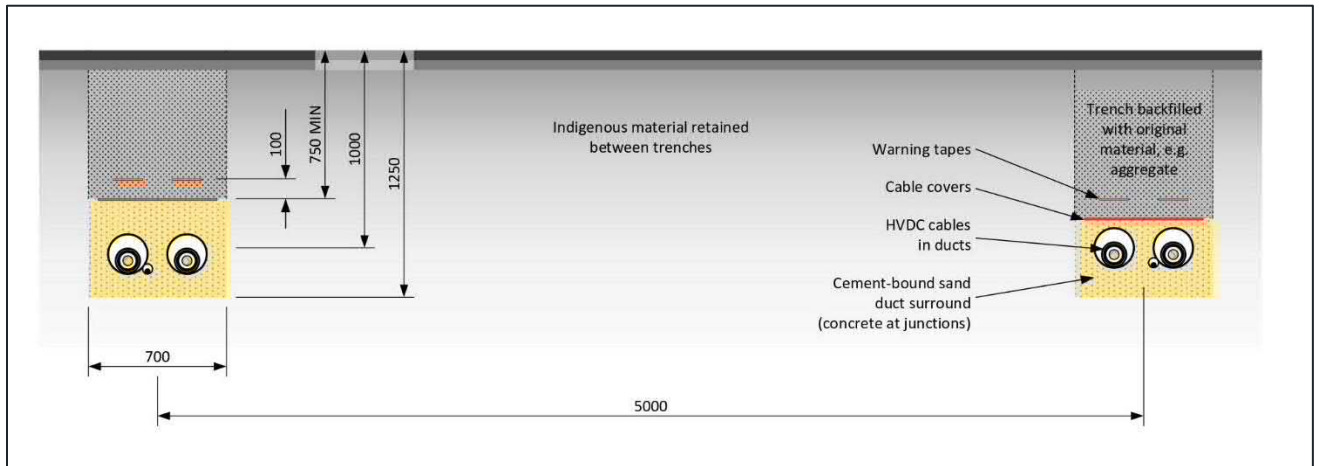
Typical Arrangement of HVDC Cable in Road, Verges and Footpath
